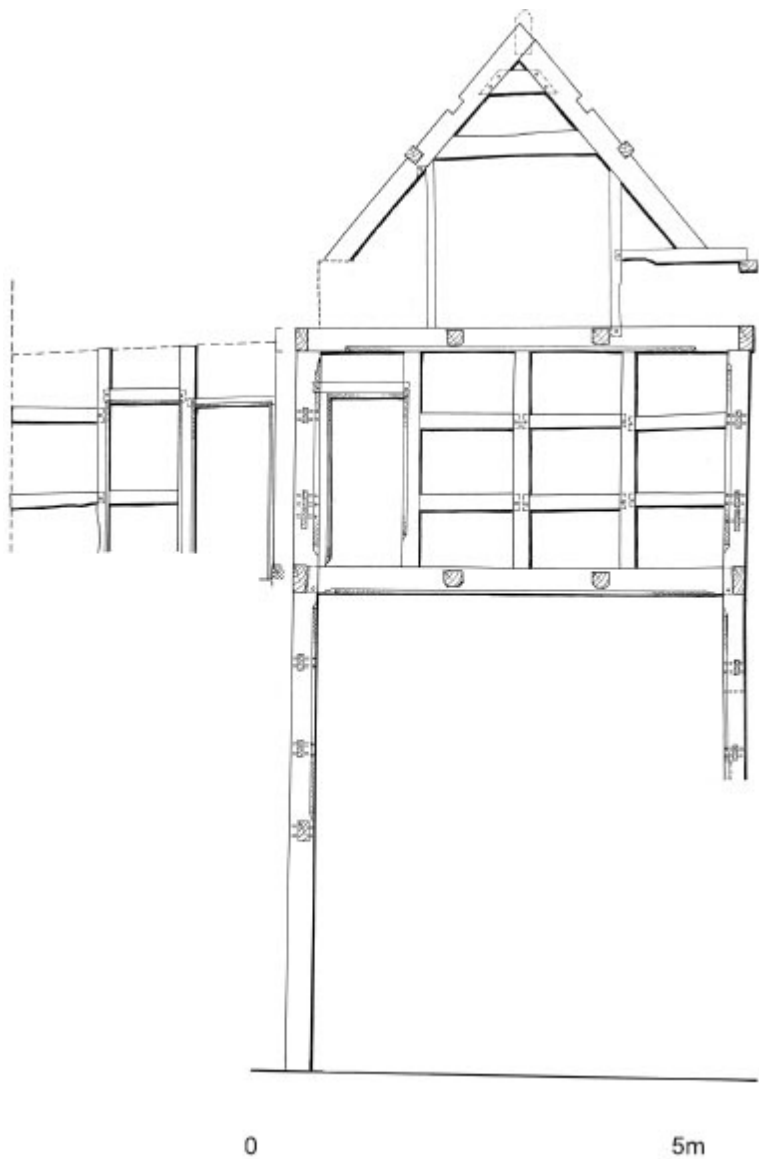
The south face of the southern cross-frame of 26 High Town, showing the only partition – on the second floor; this has a primary doorway at the western end. Adjacent to this a small section of the framing of no. 27 is also shown
